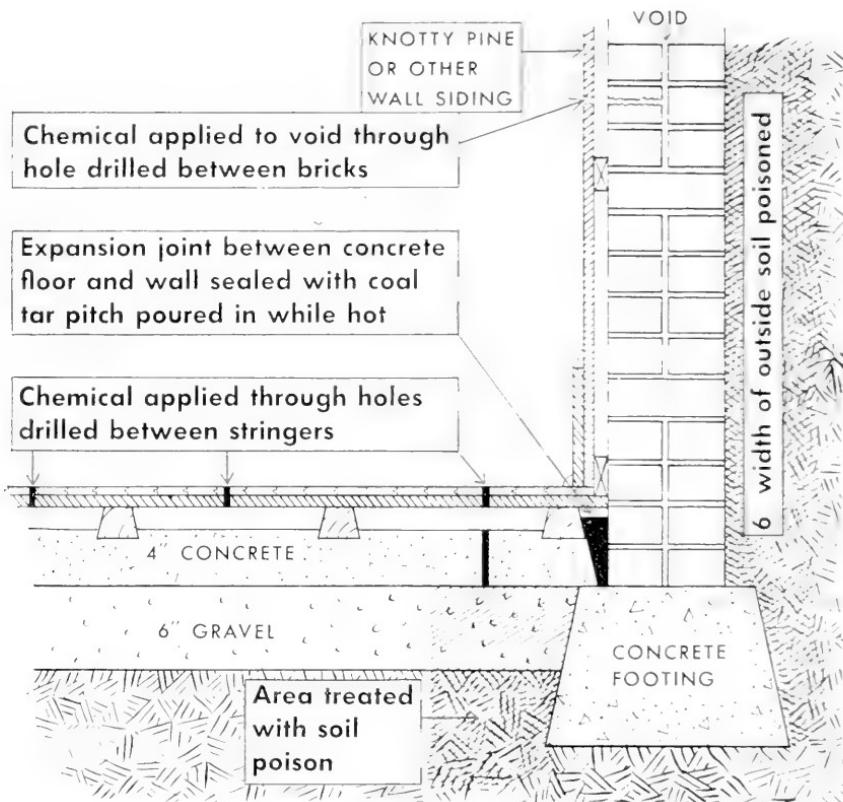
A cross section of part of basement game room indicating measures to be taken in combating a termite infestation. Soil poison is applied to the gravel and soil along concrete footing through star drill holes in concrete floor. All poisons used inside the house should be non-odorous.
